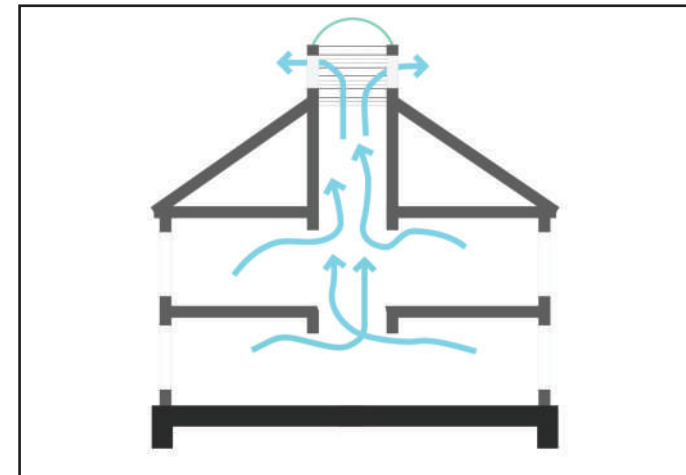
Provide Vertical Air Shaft with Intermediate Openings and Roof Vent
